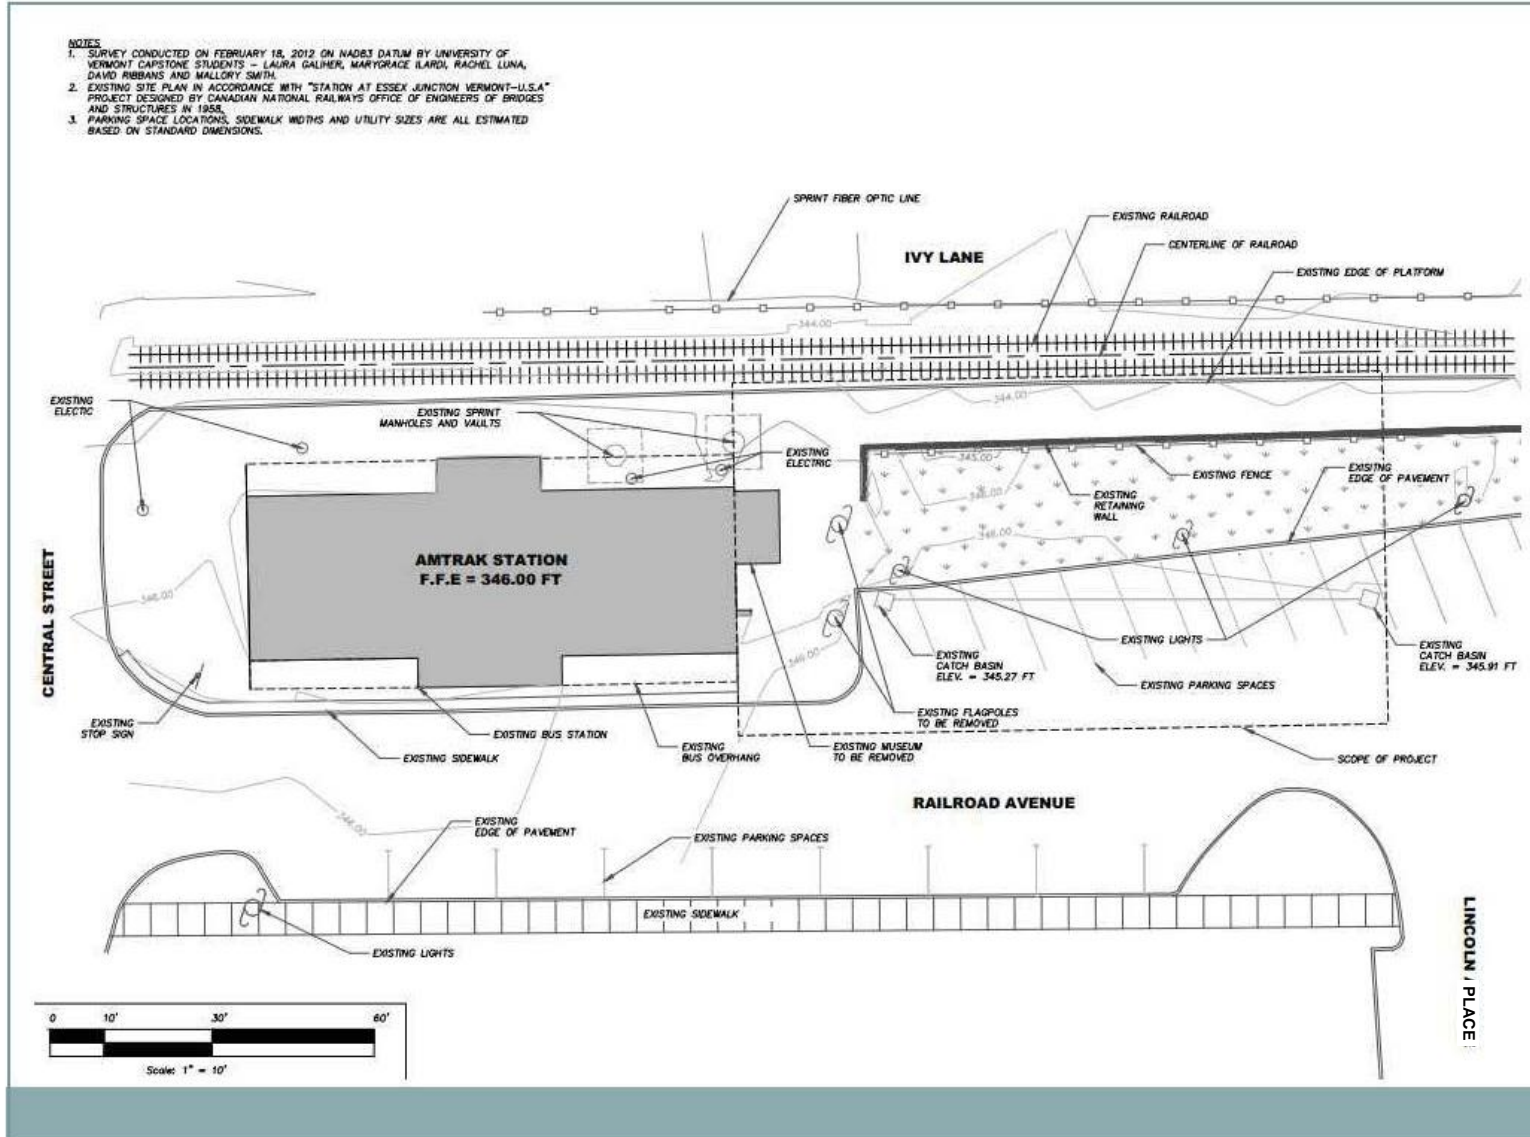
Plan showing existing conditions for the Amtrak station (provided by RSG).
